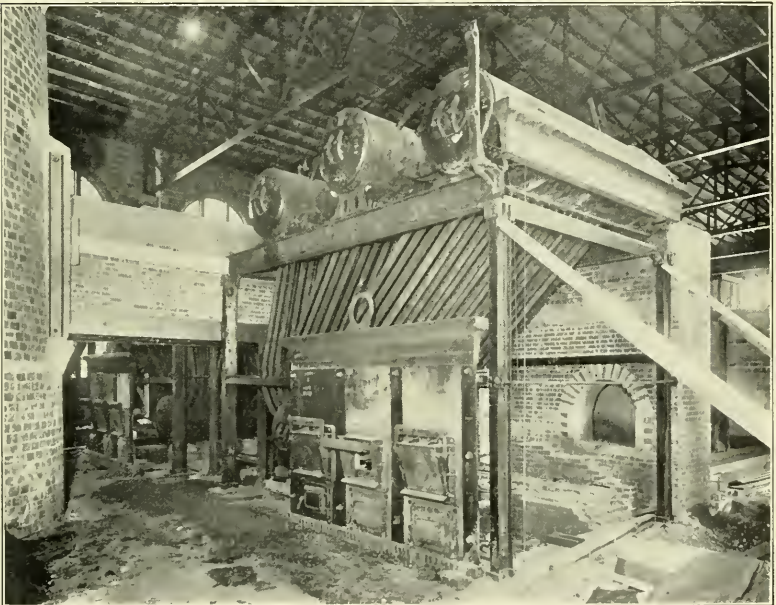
BOILERS FOR WILLIAMSBURG BRIDGE LIGHTING STATION AND
